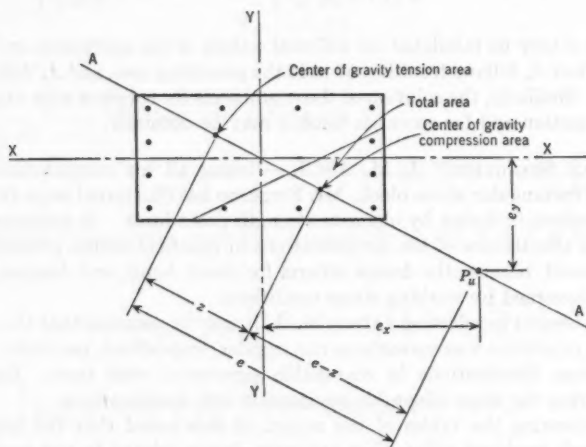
LOCATION OF CENTERS OF GRAVITY
